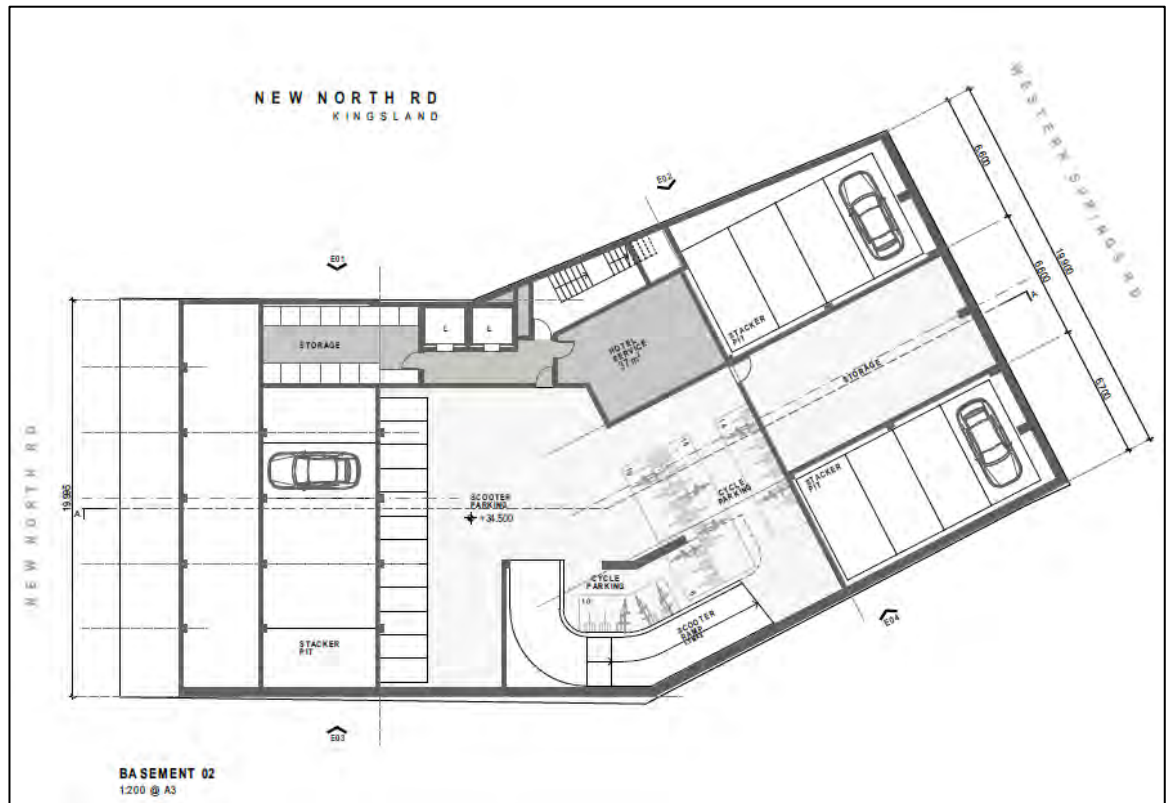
Plan of the basement level of the proposed residential apartment development at 617-619 New North Road, Kingsland. Source: MATZ Architects Ltd.
